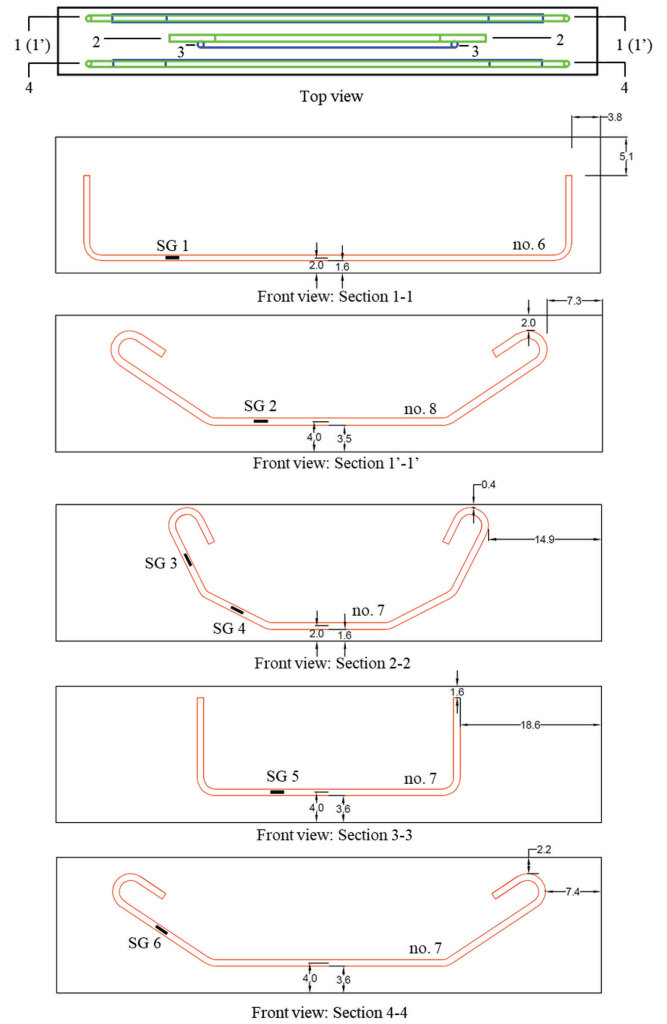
Reinforcement details of specimen with optimized STM layout II. (Note: Labeled dimensions are in inches; 1.0 in. = 25.4 mm.)
